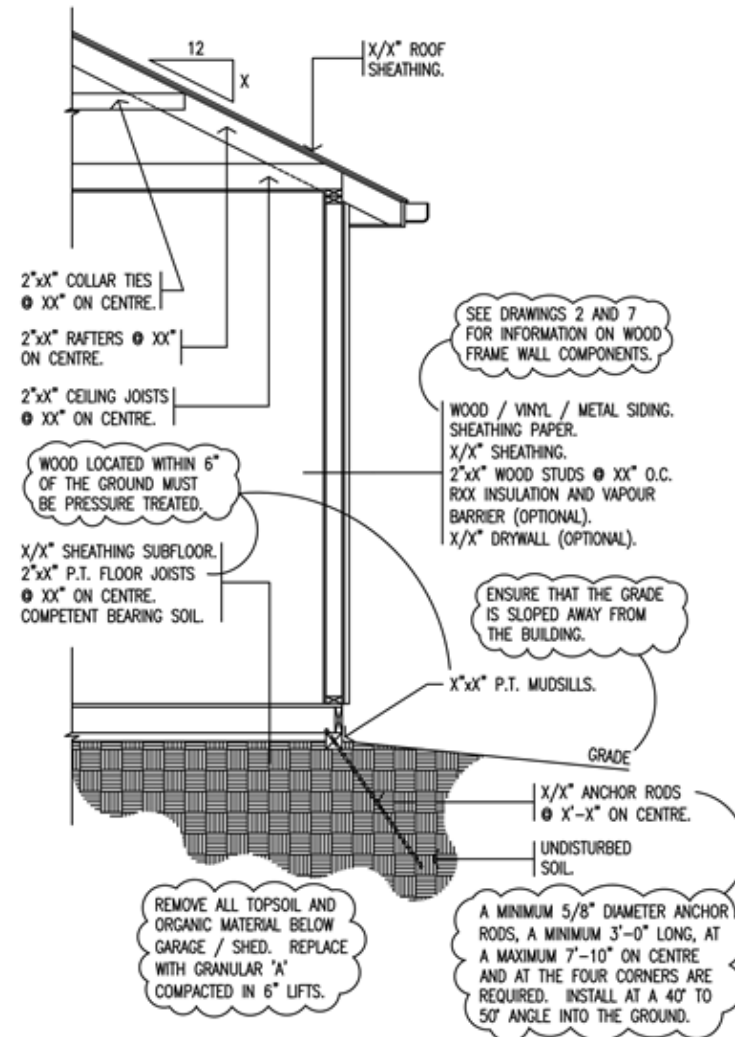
of 9: ALTERNATE CONSTRUCTION – Accessory Structure
